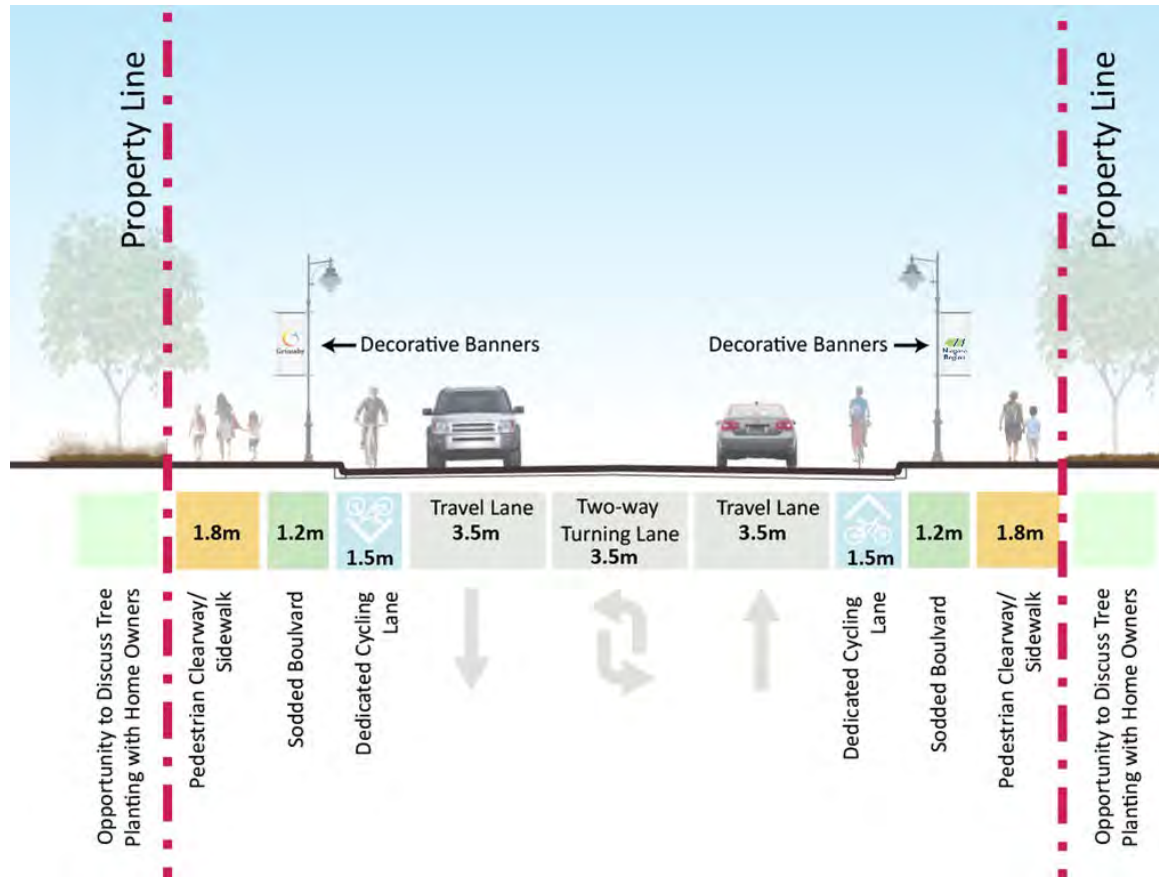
Proposed Livingston Avenue Road Cross Section from Casablanca Boulevard to West of Emily Street
